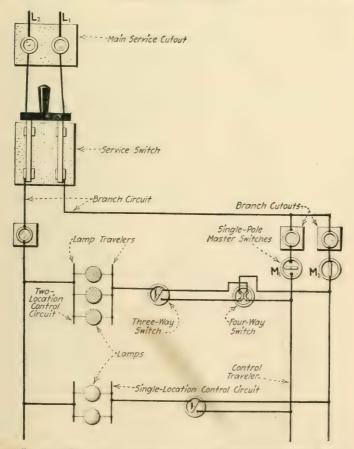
Elementary wiring diagram of a universal-control master circuit.
